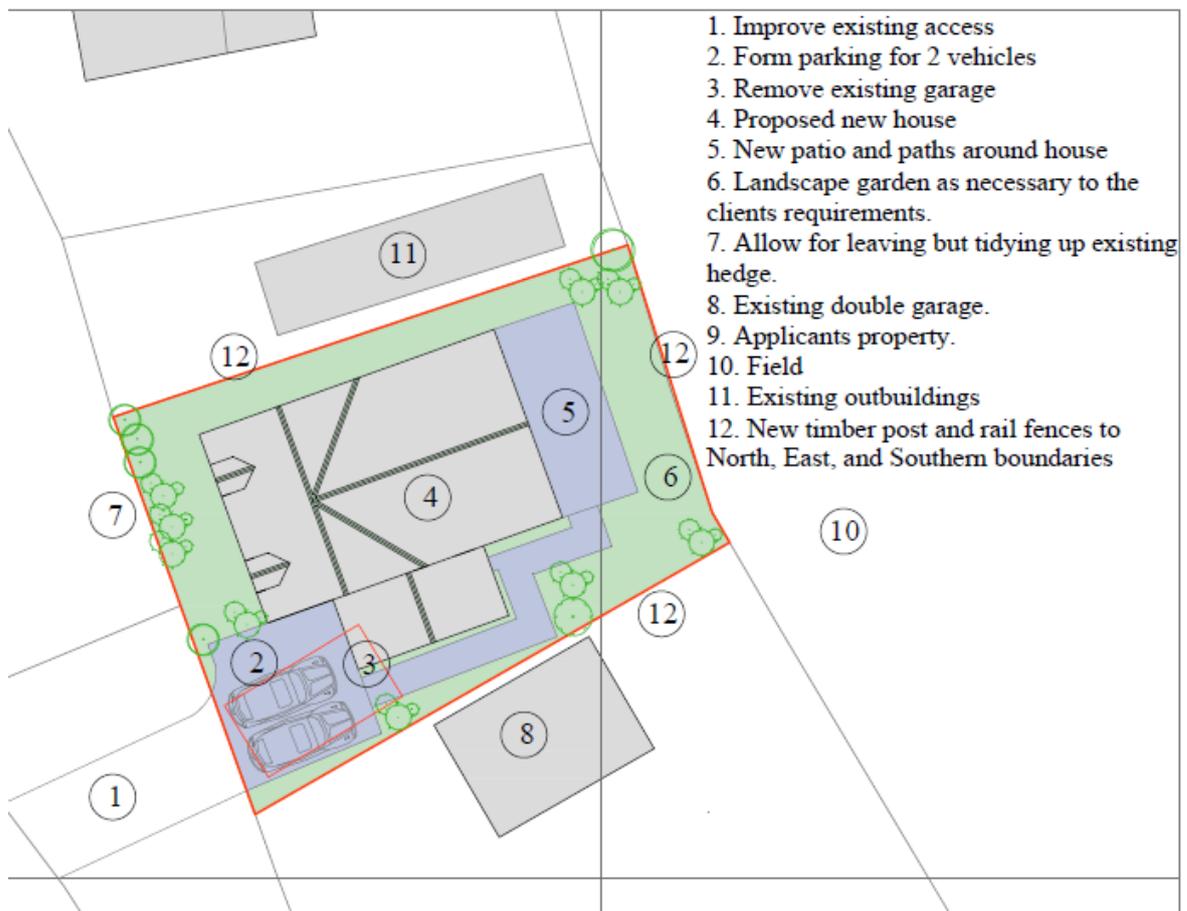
Extract from AH073-P02(B) Site Layout Plan (Source: Aidan Hume Design)
